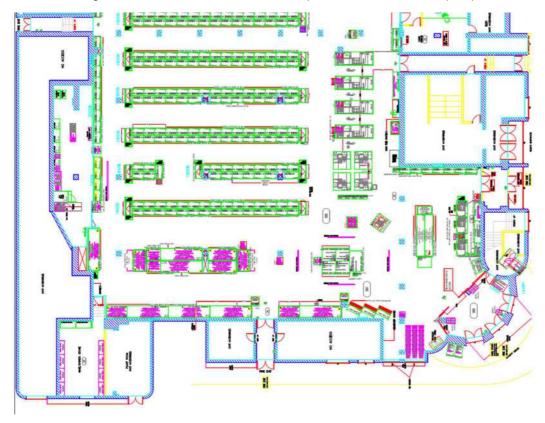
Partial 'As Built' ground floor plan of the current co-op supermarket (Source: Lidl UK/Space Architects)
